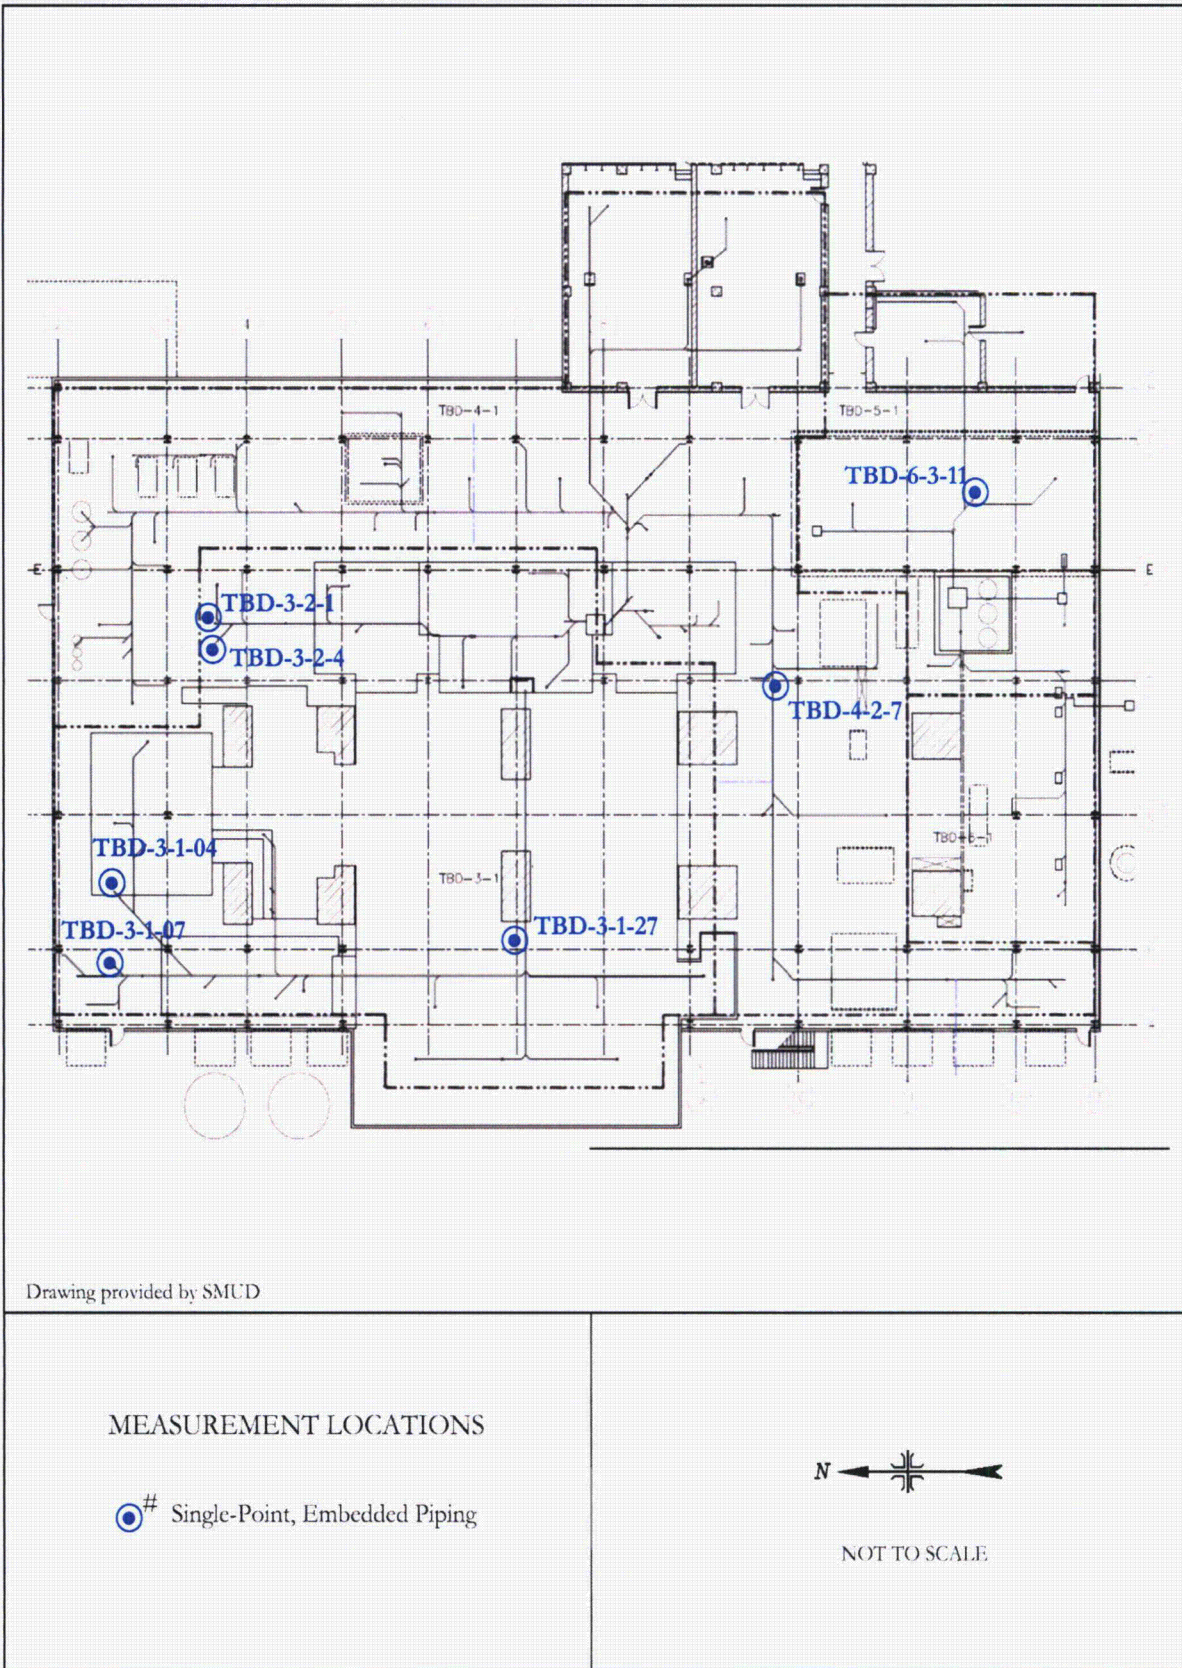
Turbine Building; Ground Level Elevation - Embedded Piping Measurement Locations
